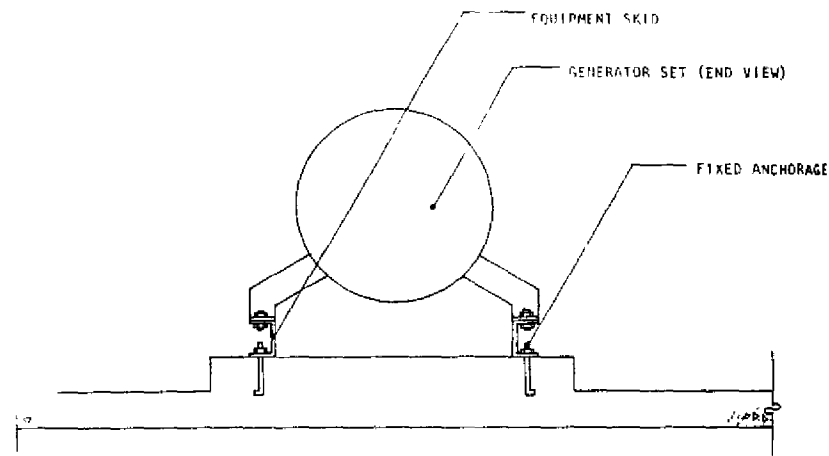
Emergency power supply systems. Generator set showing fixed anchorage to structural concrete.
